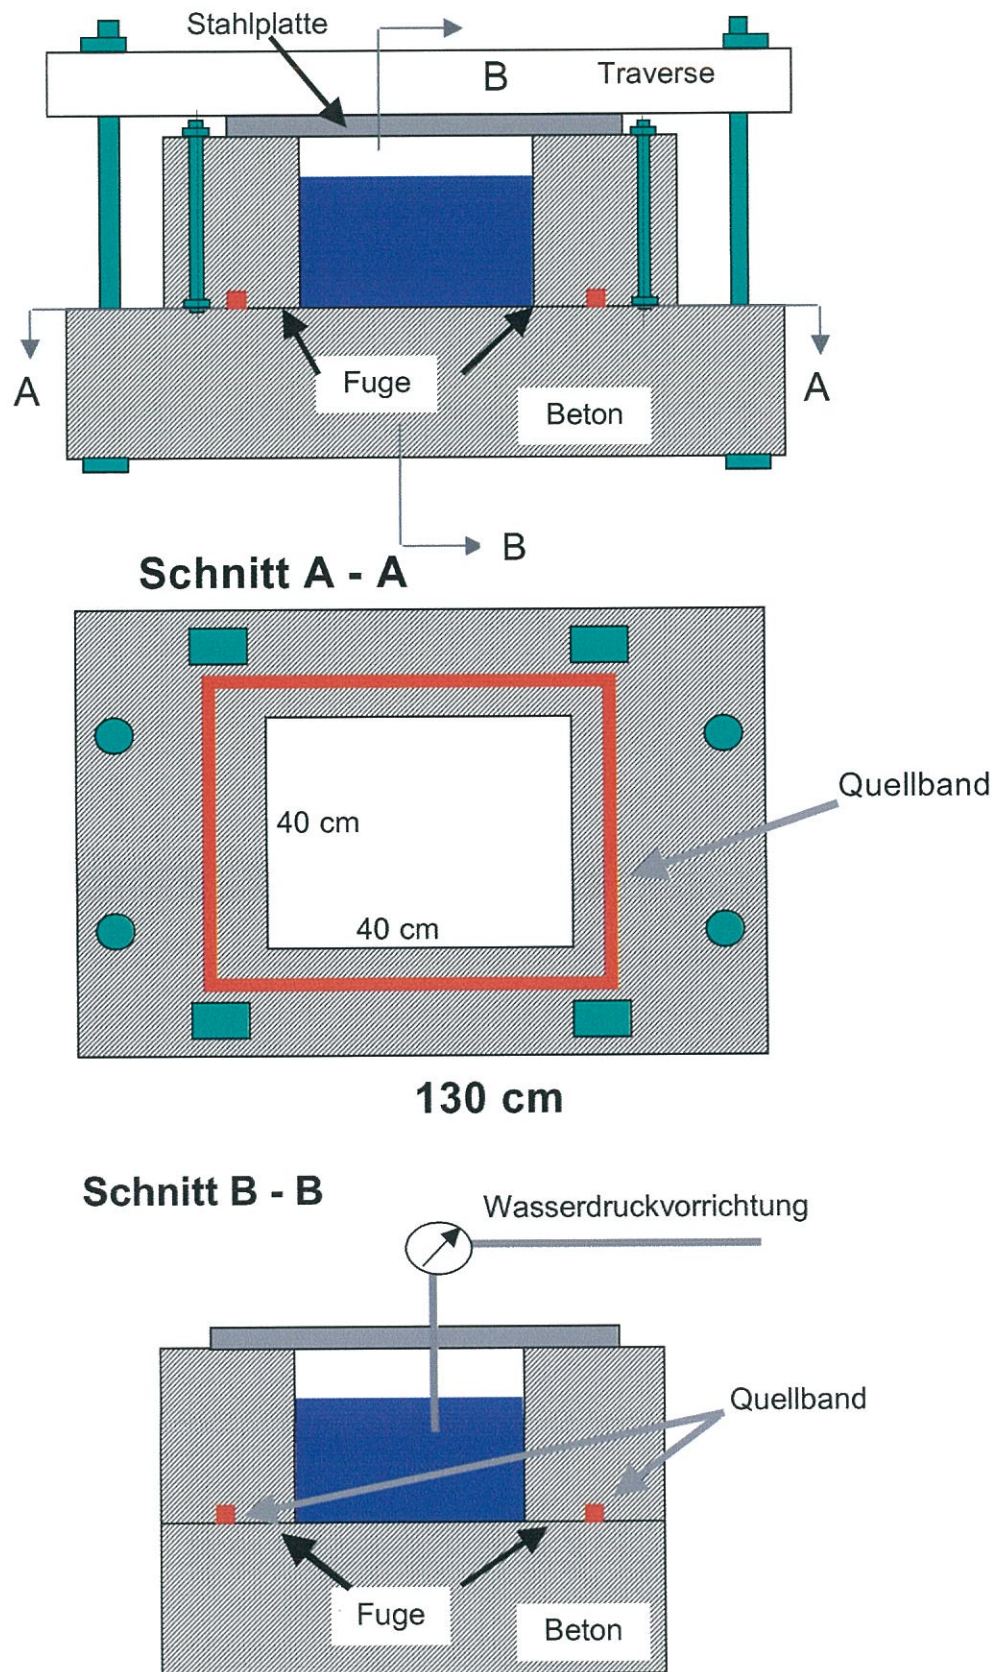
Test installation, leak test (construction joint sealing with a swelling tape); sketch
